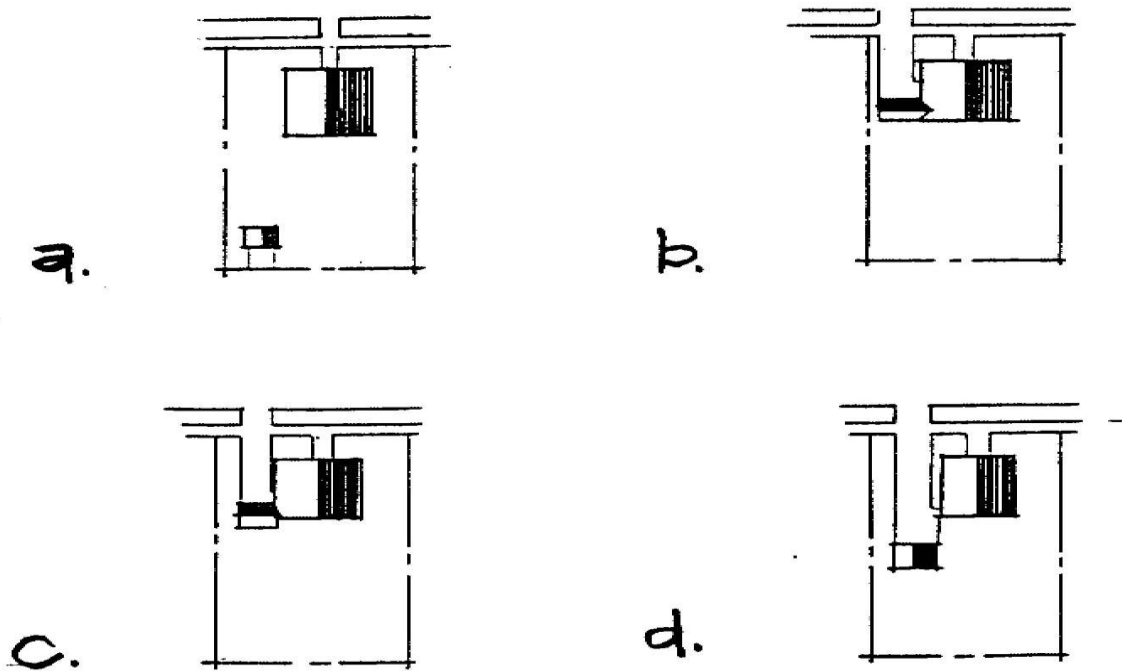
Plan-view diagrams of four alternative garage locations on a single-family housing lot: a) detached garage is accessed from an alley; b and c) attached garage is accessed from the local street, d) detached garage, behind the house, is accessed from the local street.
